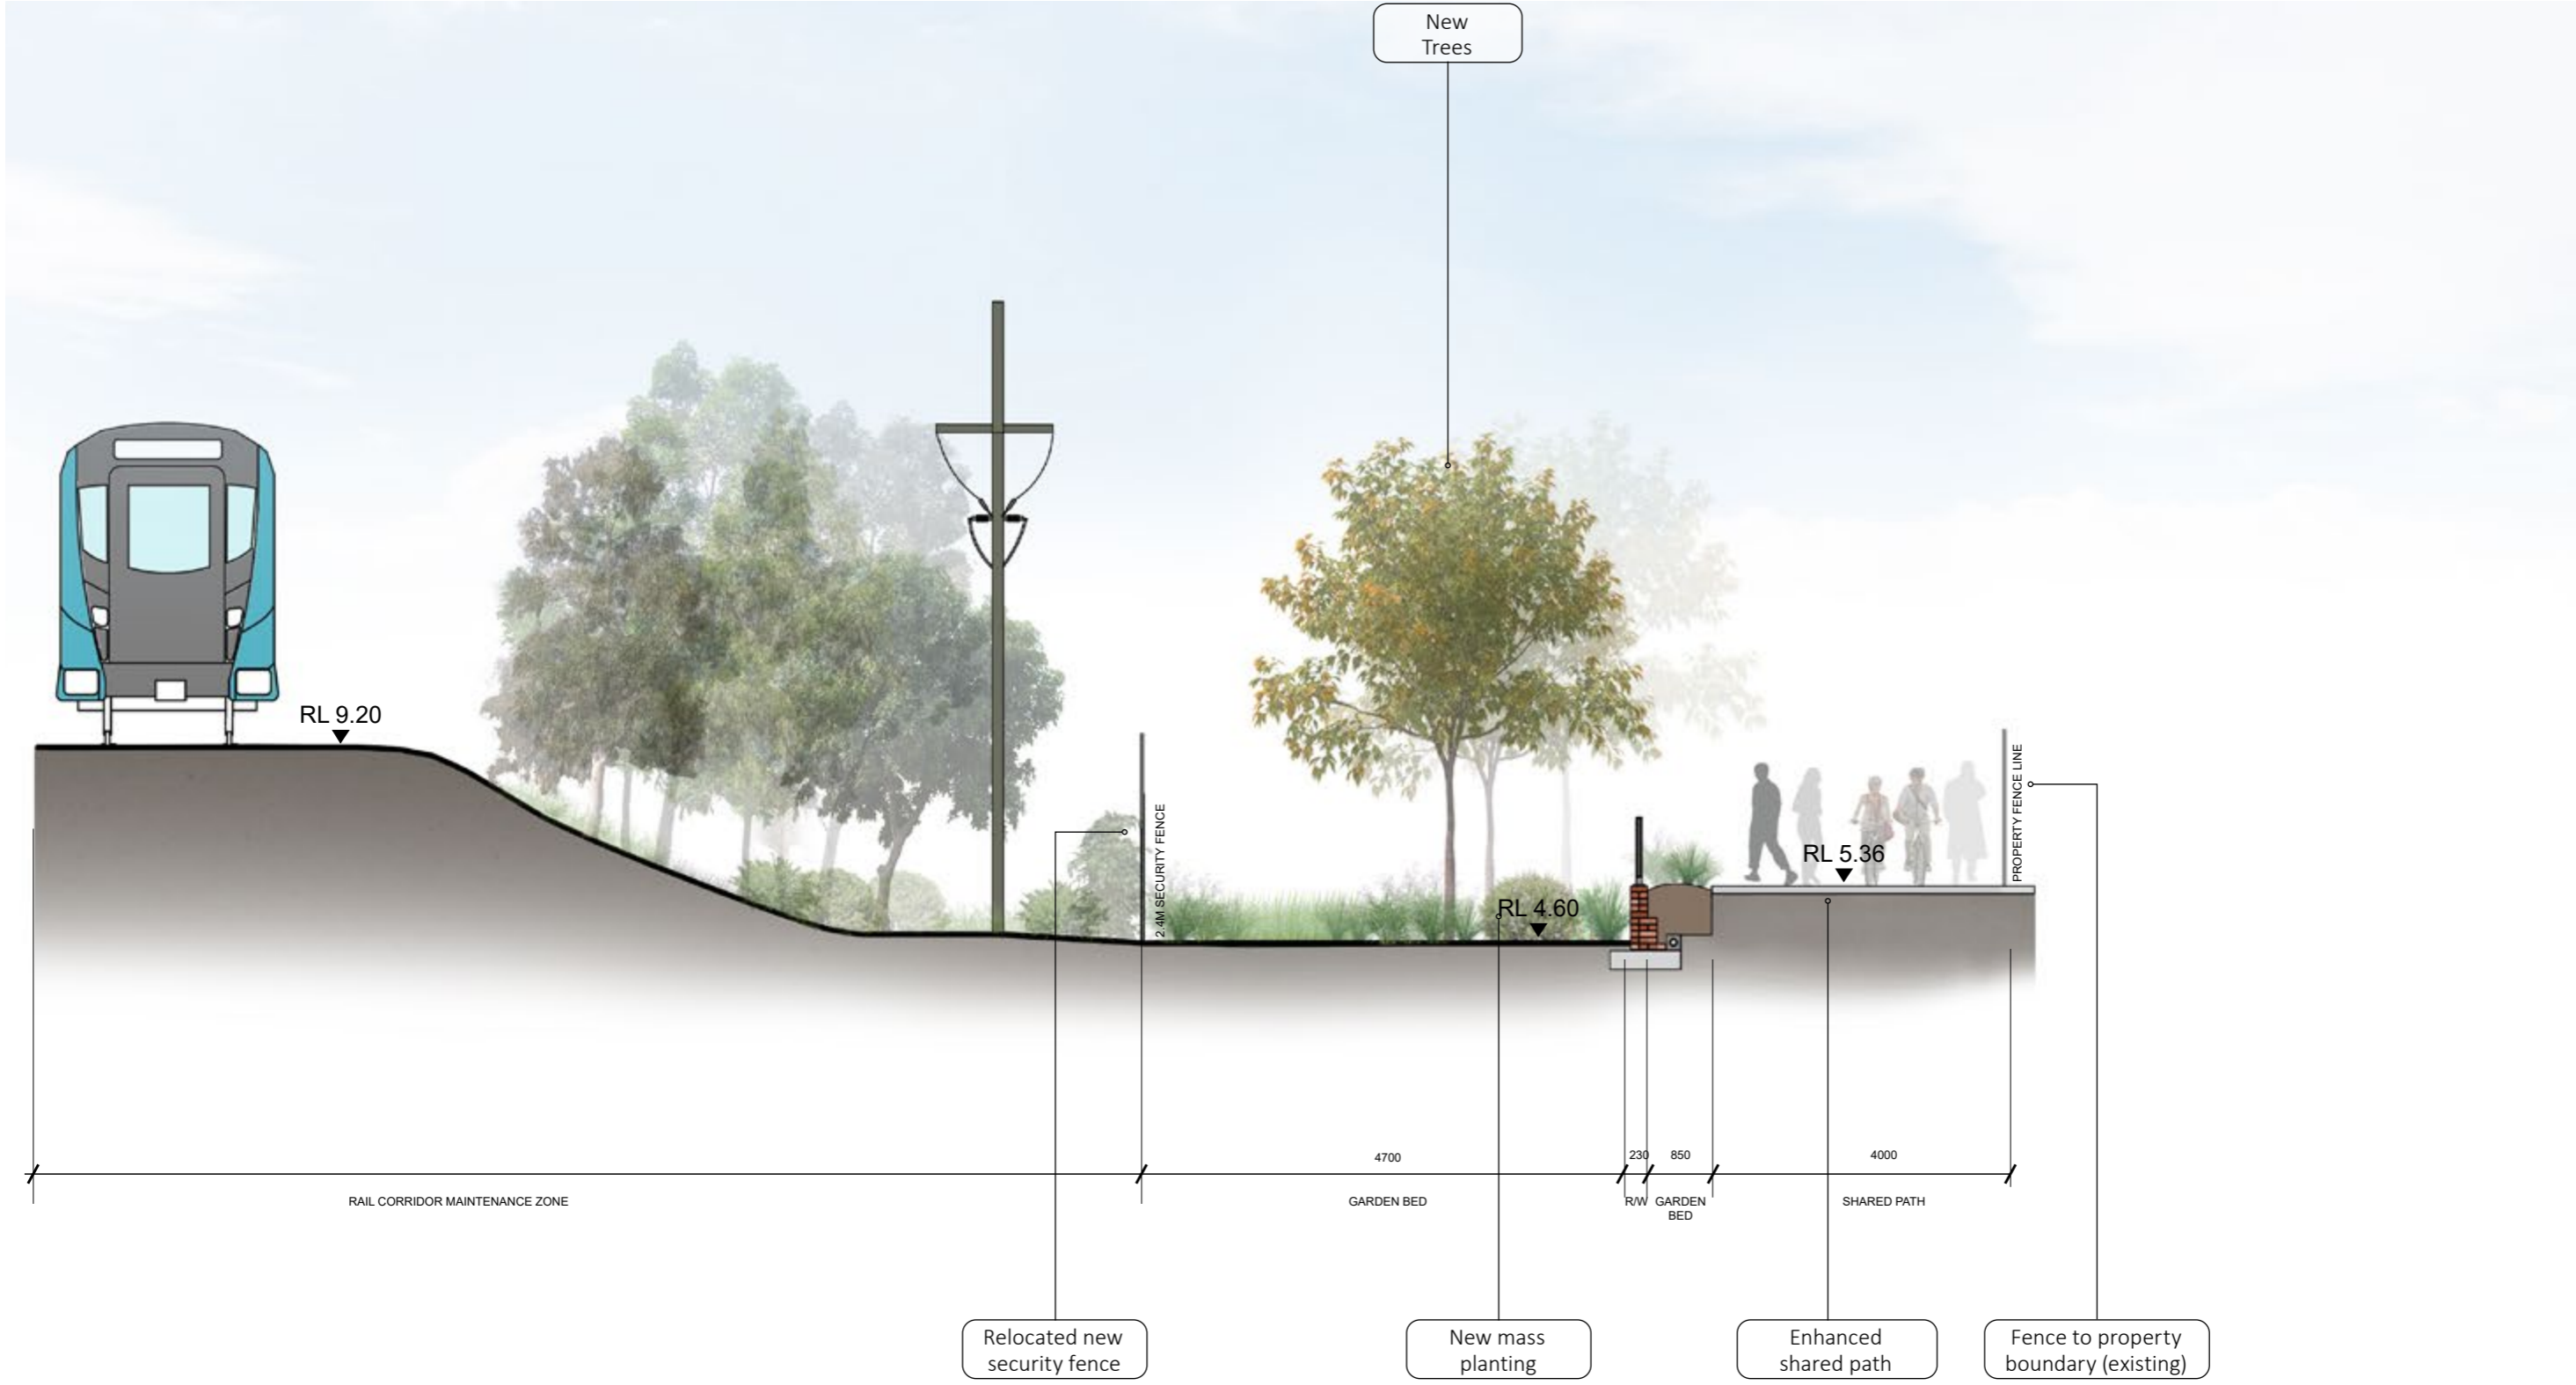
Section C Marrickville - Detailed section of the shared path
